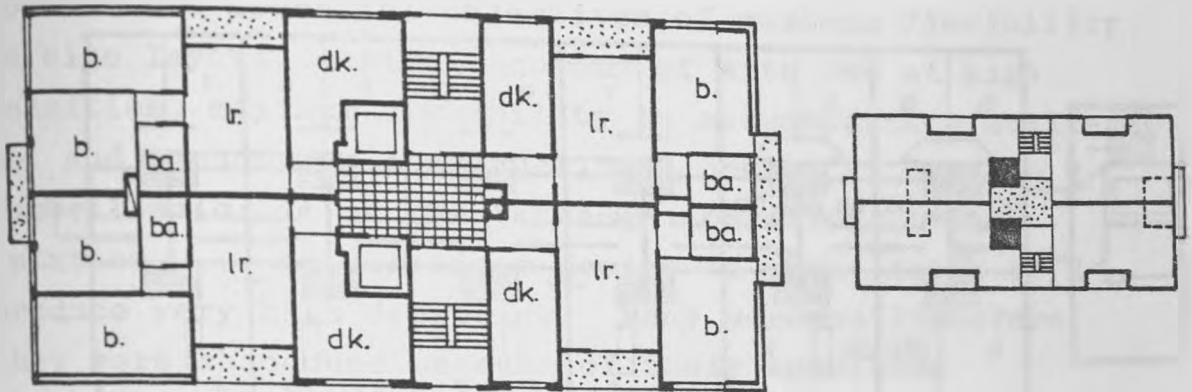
"CROSS VENTILATED COMMON ACCESS HALL" FLATS IN 11 STOREY TOWER BLOCK.
